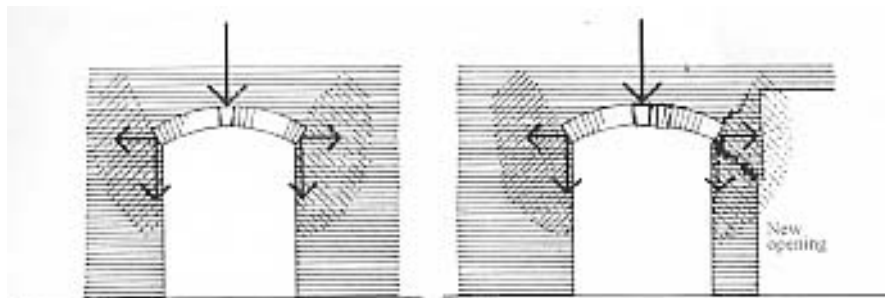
Original arch (left) designed to transfer loads onto the load bearing wall on either side. The opening (right) weakens the wall on that side of the arch and, as a result, the remaining pier will crack and may collapse.
